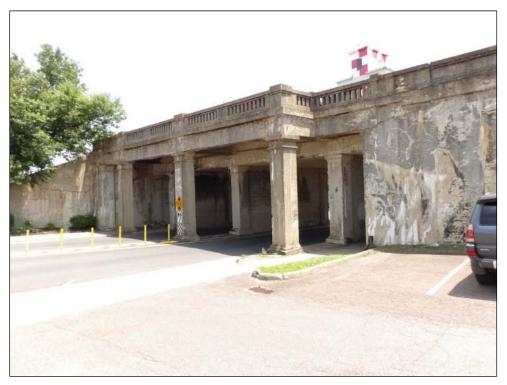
VIEW OF THE ELEVATED TRACK OF CHARLES STREET BRIDGE IN FREDERICKSBURG, PART OF THE RAPPAHANNOCK RIVER RAILROAD BRIDGE (111-0132-0025)
